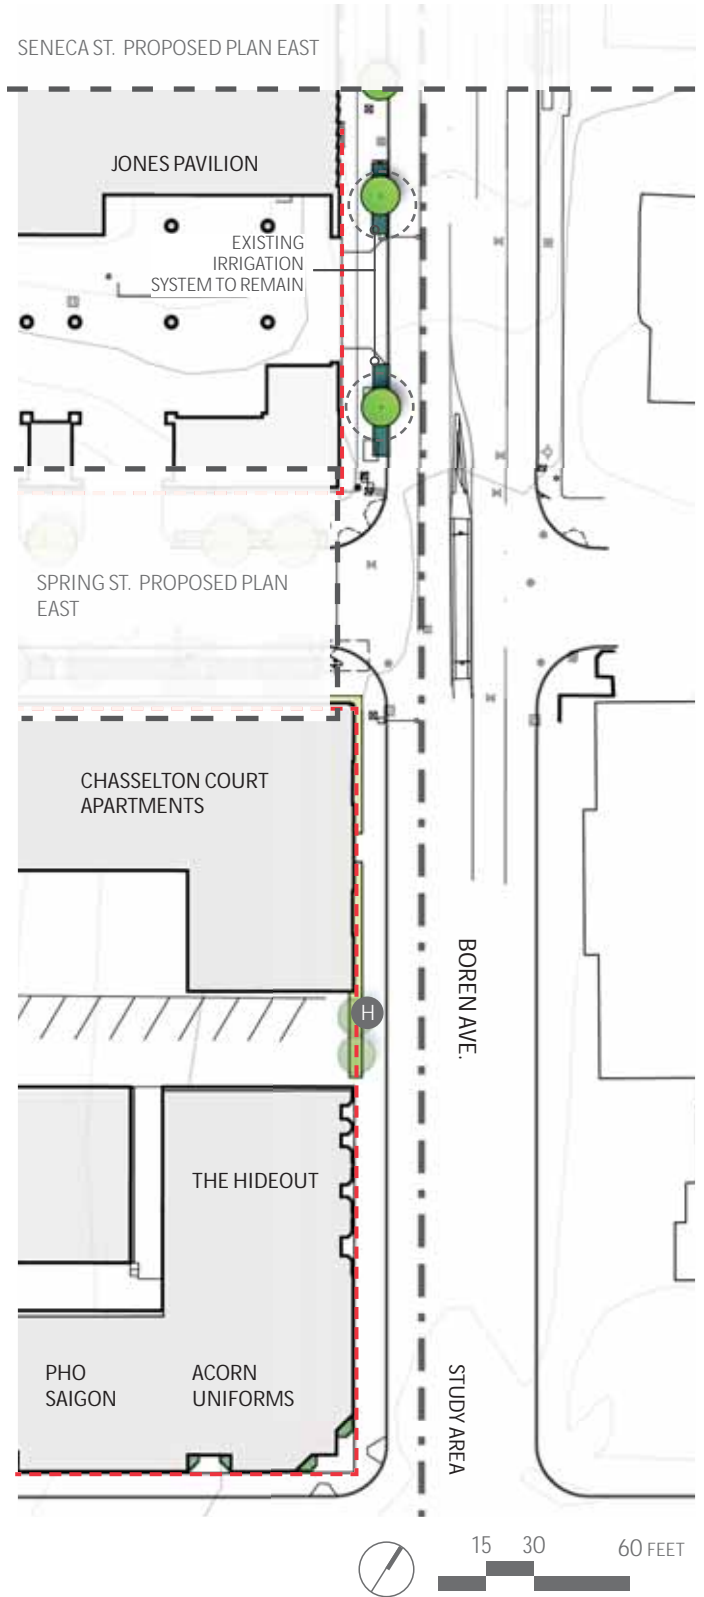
BOREN AVENUE PROPOSED PLAN SOUTH
